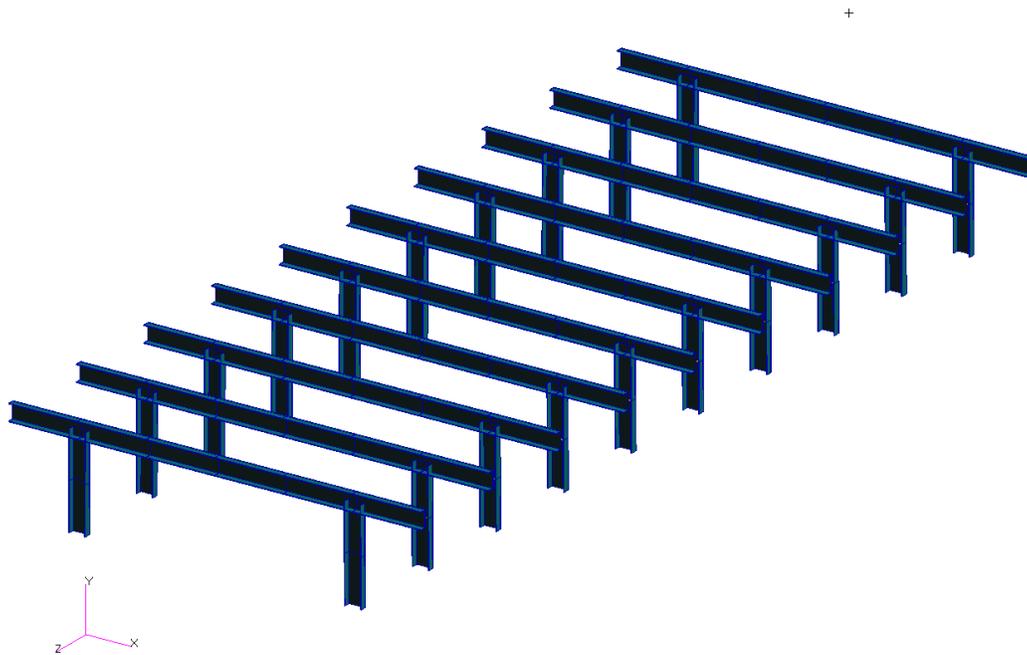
Isometric three-dimensional view of the horizontal floor beams and vertical floor supports.
